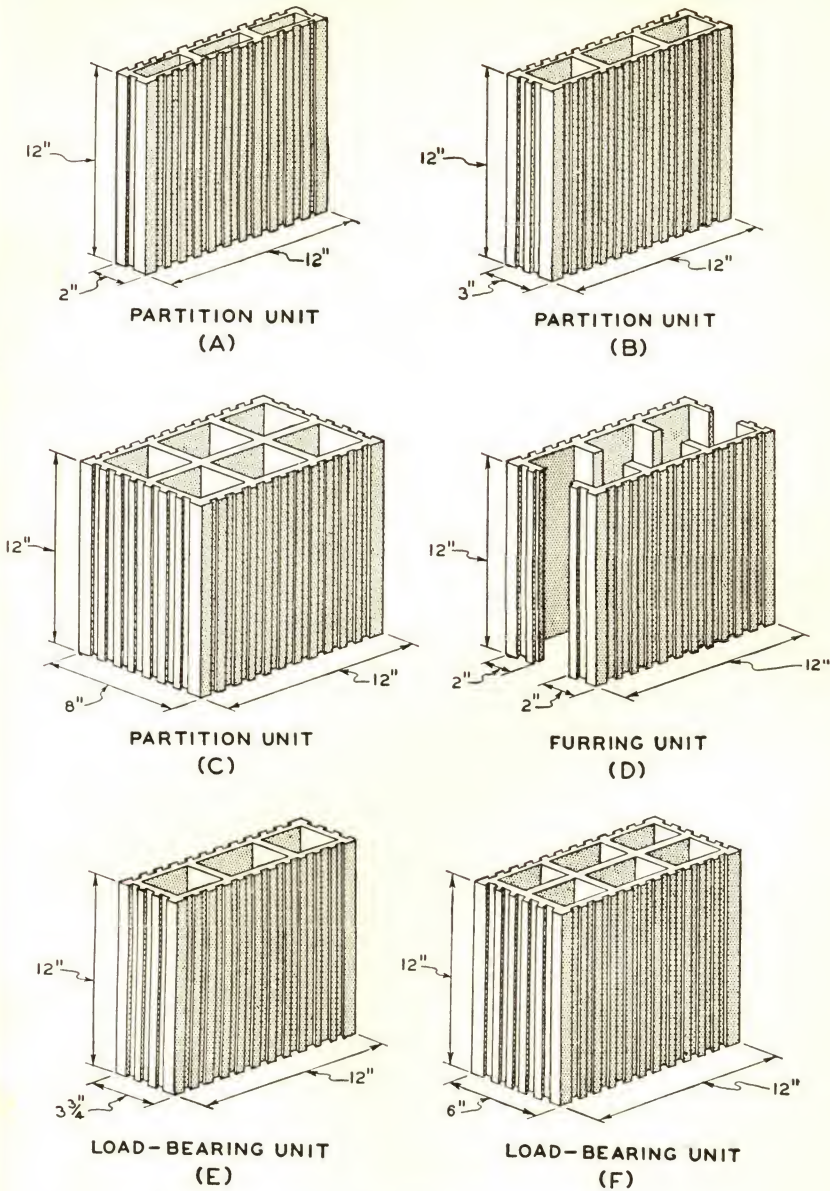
Typical Shapes and Sizes of Structural Clay Tile Units
